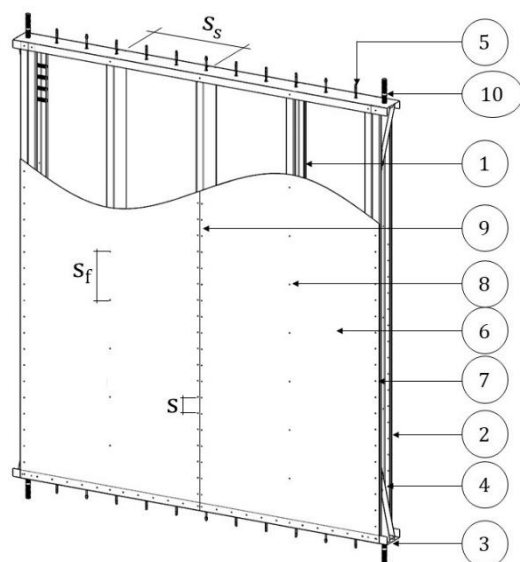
CFS shear wall: 1. stud; 2. chord stud; 3. track; 4. hold-down; 5. shear anchorage; 6. steel sheet or wood or gypsum sheathing; 7. screw at panel edge; 8. screw in the panel field; 9. sheathing joint; 10. tension anchorage; s_s : stud spacing; s_f : screw spacing in the panel field; s : screw spacing at panel edge.
